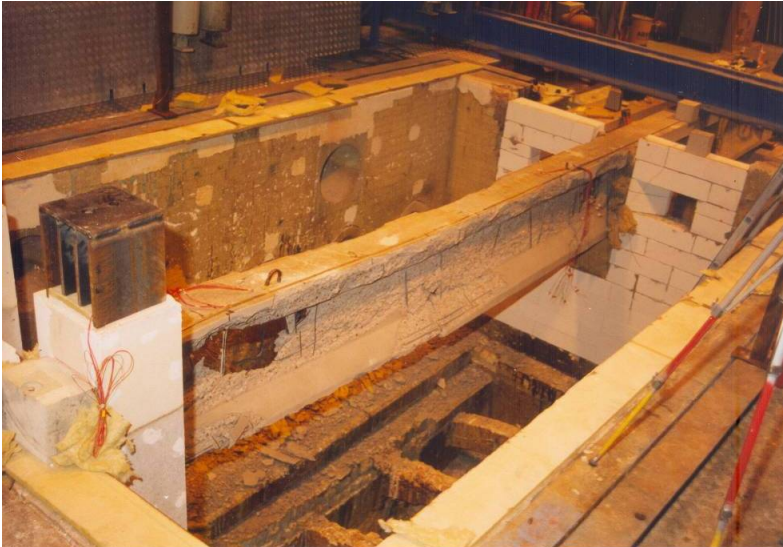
Spalled beam with slender cross-section, Bengtsson (1997)
